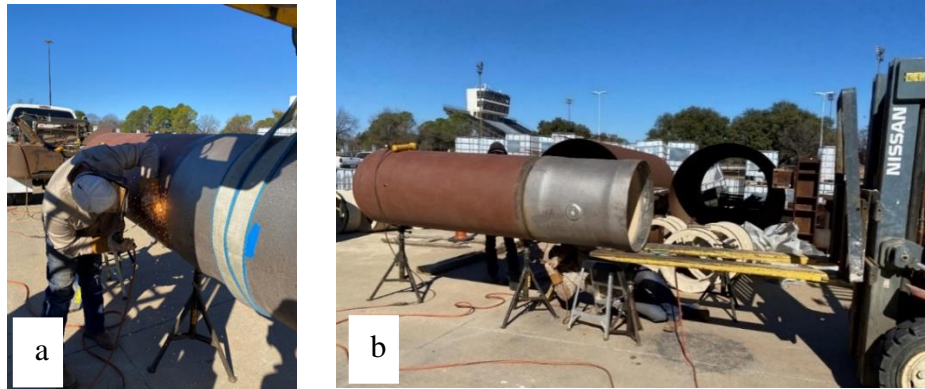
(a) Welding Spigot End to Test Section
